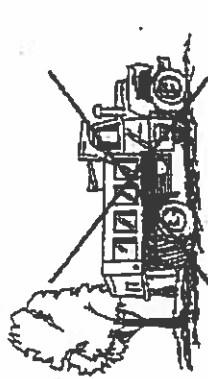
Avoid running heavy equipment over the protected root zone, which damages sensitive tree roots.
